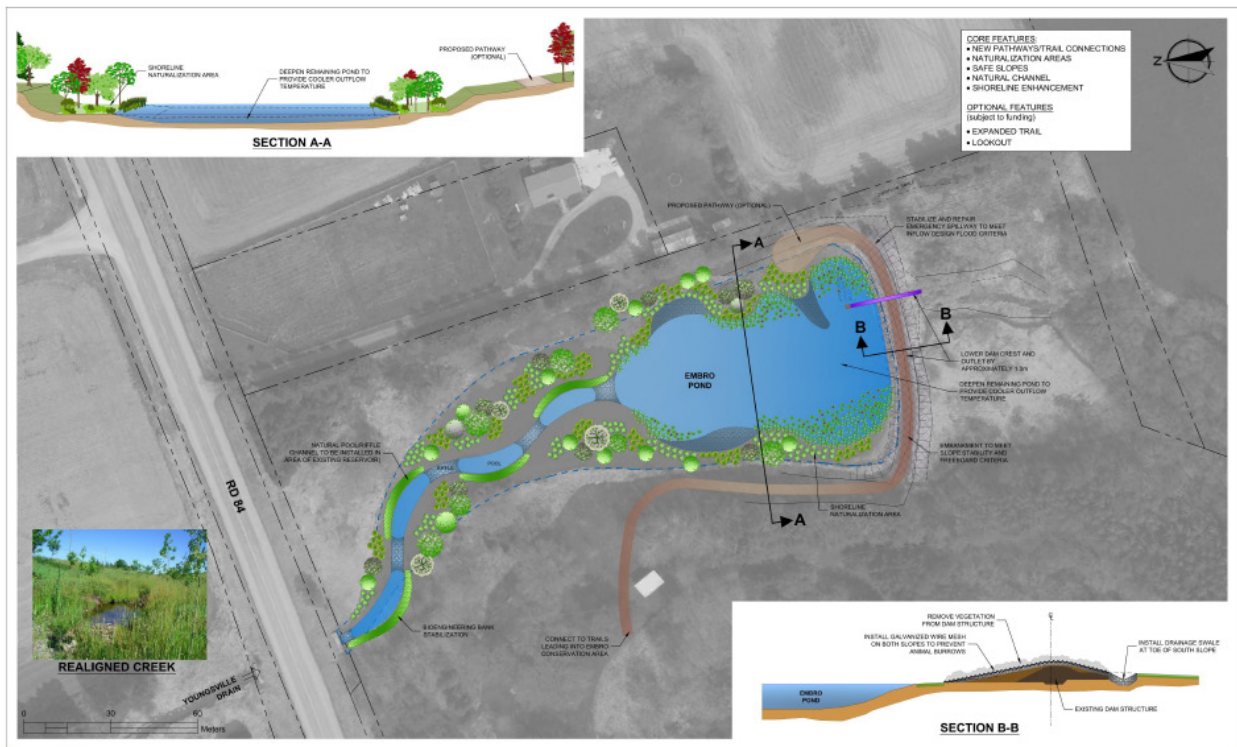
Alternative 5: Lower Dam Crest and Outlet and Naturalize New Pond Perimeter
